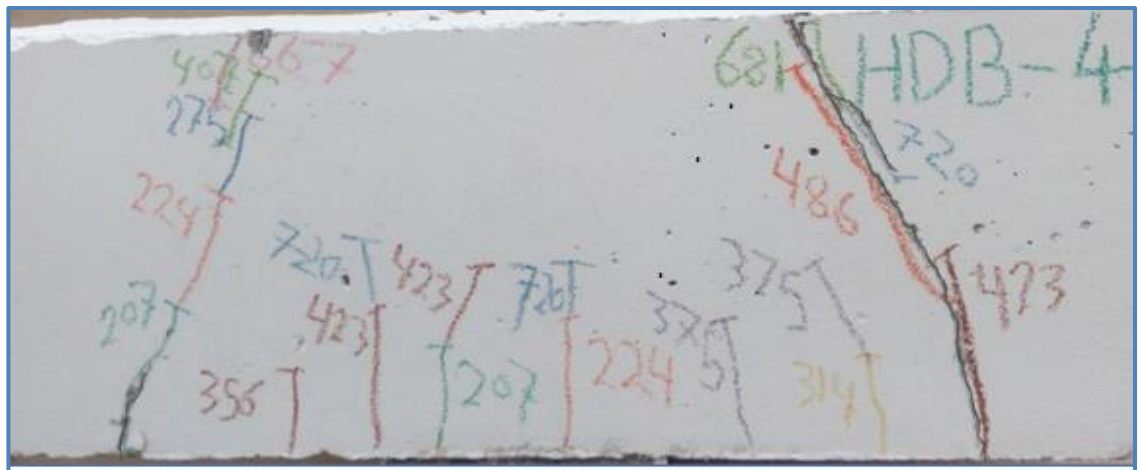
Crack pattern of hybrid deep beam HDB-4 at failure.
